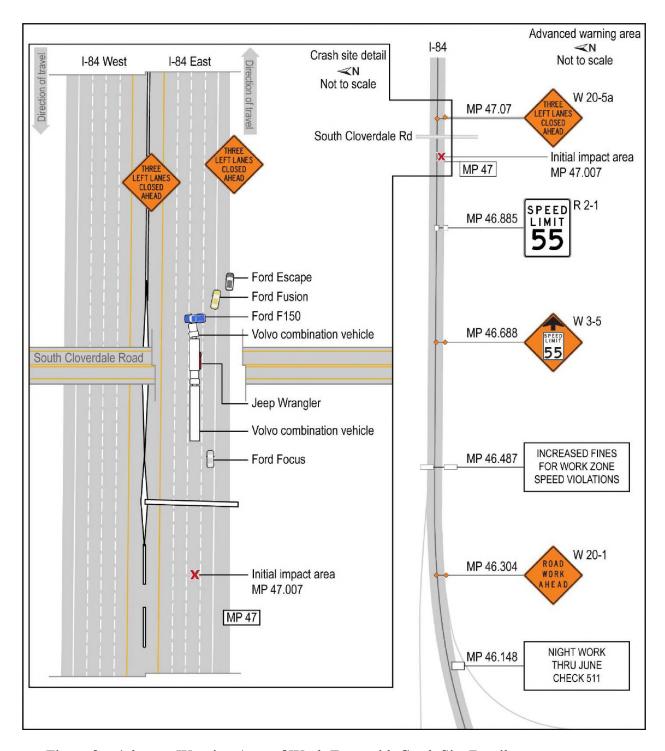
Advance Warning Area of Work Zone with Crash Site Detail
